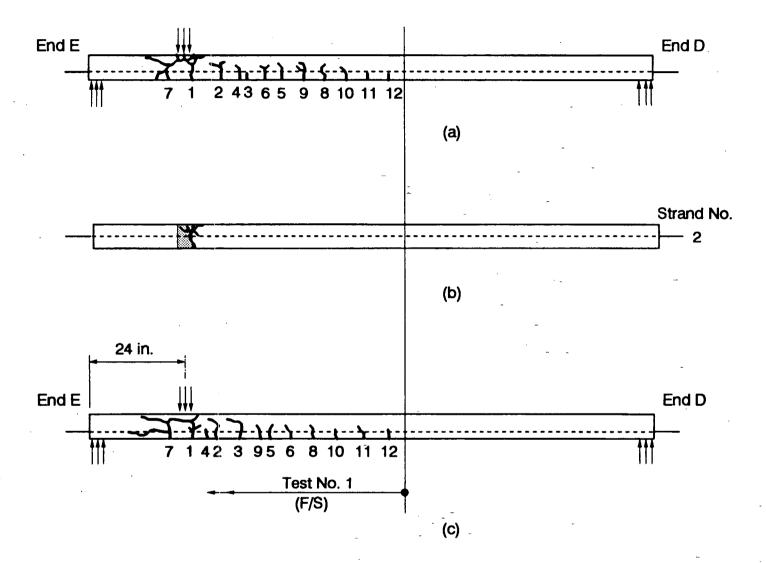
Crack pattern for D-type Specimen No. 17-6.0DC-10: (a) mirrored side view along Strand No. 2; (b) top view; (c) side view along Strand No. 2
